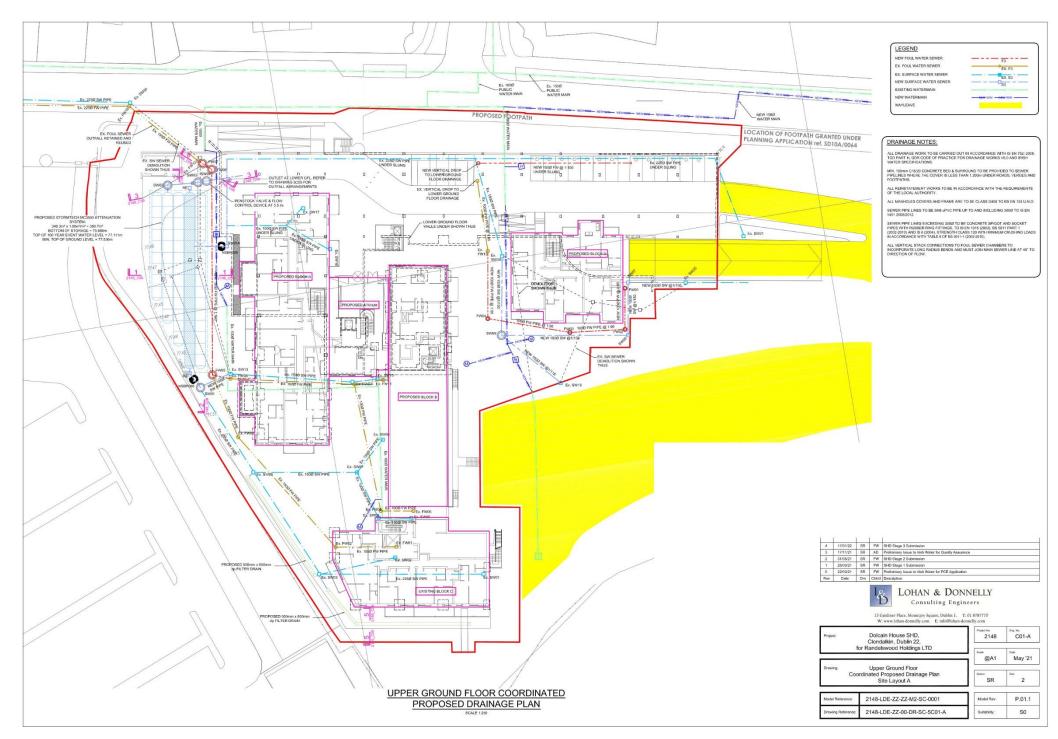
Proposed drainage plan - upper ground floor (co-ordinated) - Option A
